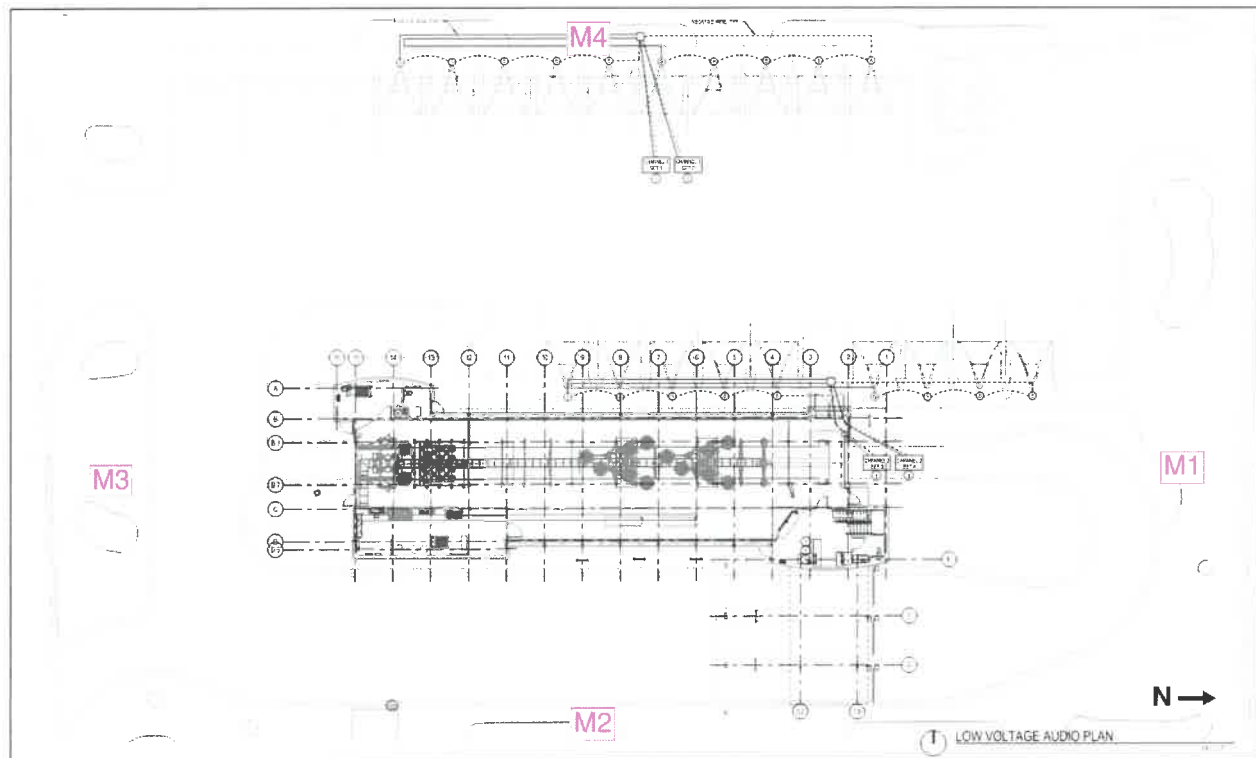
Hudsonville Site Plan with Long-Term Measurement Locations
